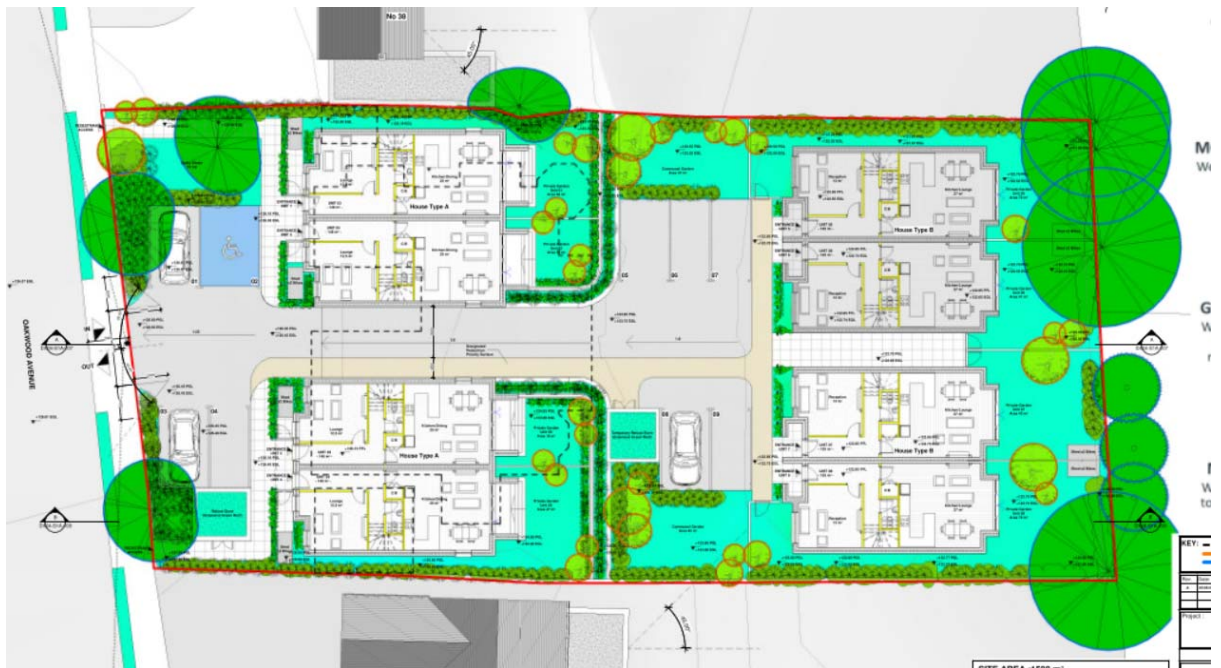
Proposed site plan showing proposal in relation to neighbouring properties.
